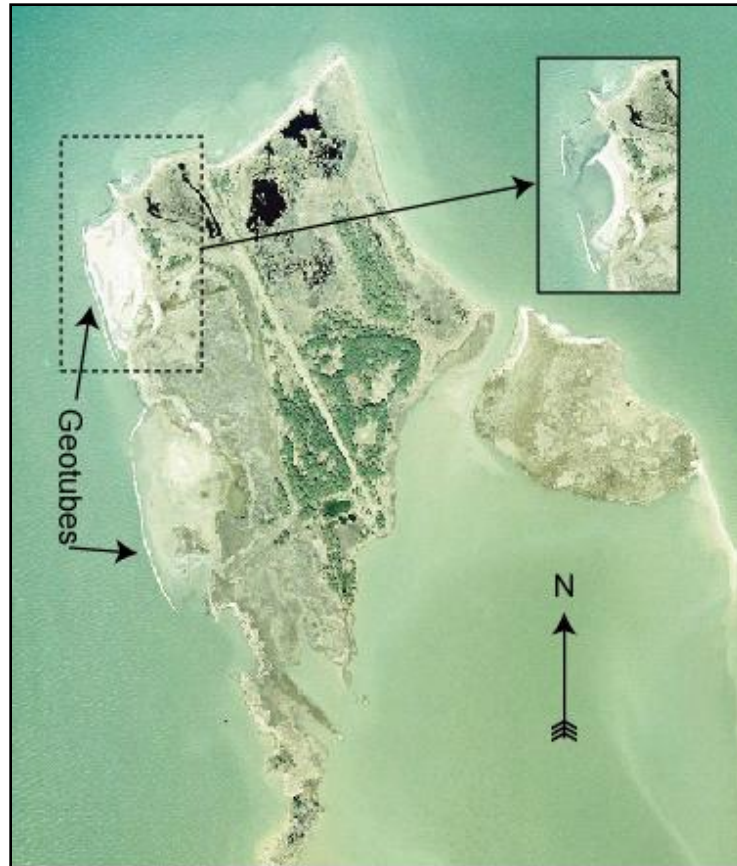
Location of geotextile tubes on western side of Barren Island (photo 1994).
